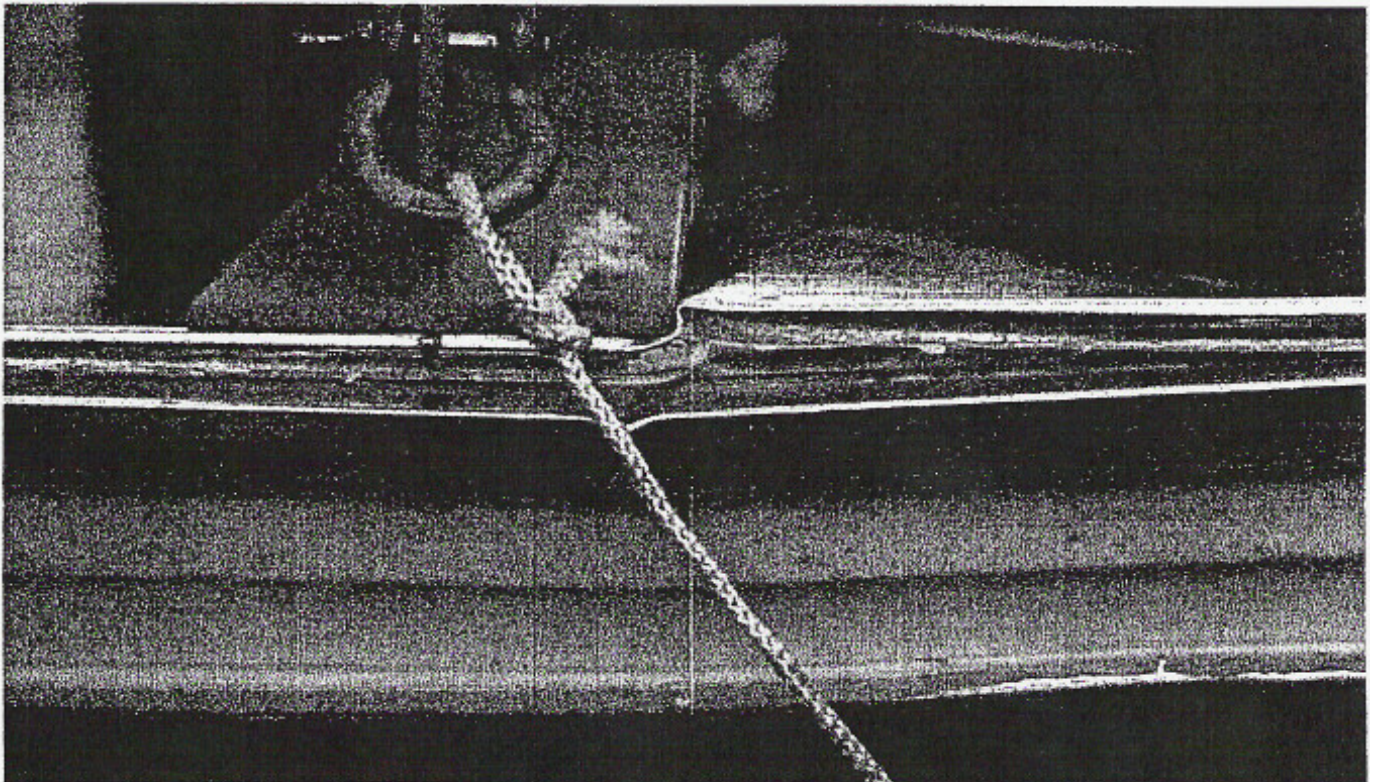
Closeup of Failure of 8' Galv.-Galv. Panel Under Transverse Loading
